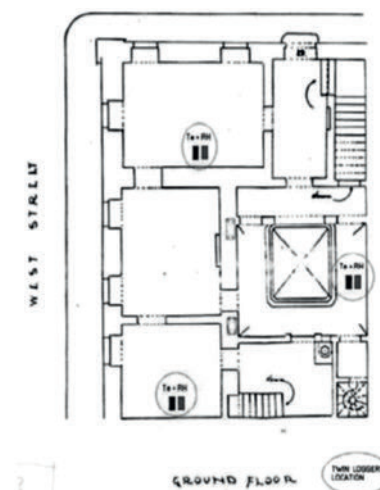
Building 2: 89, Old Theatre Street, Valletta
